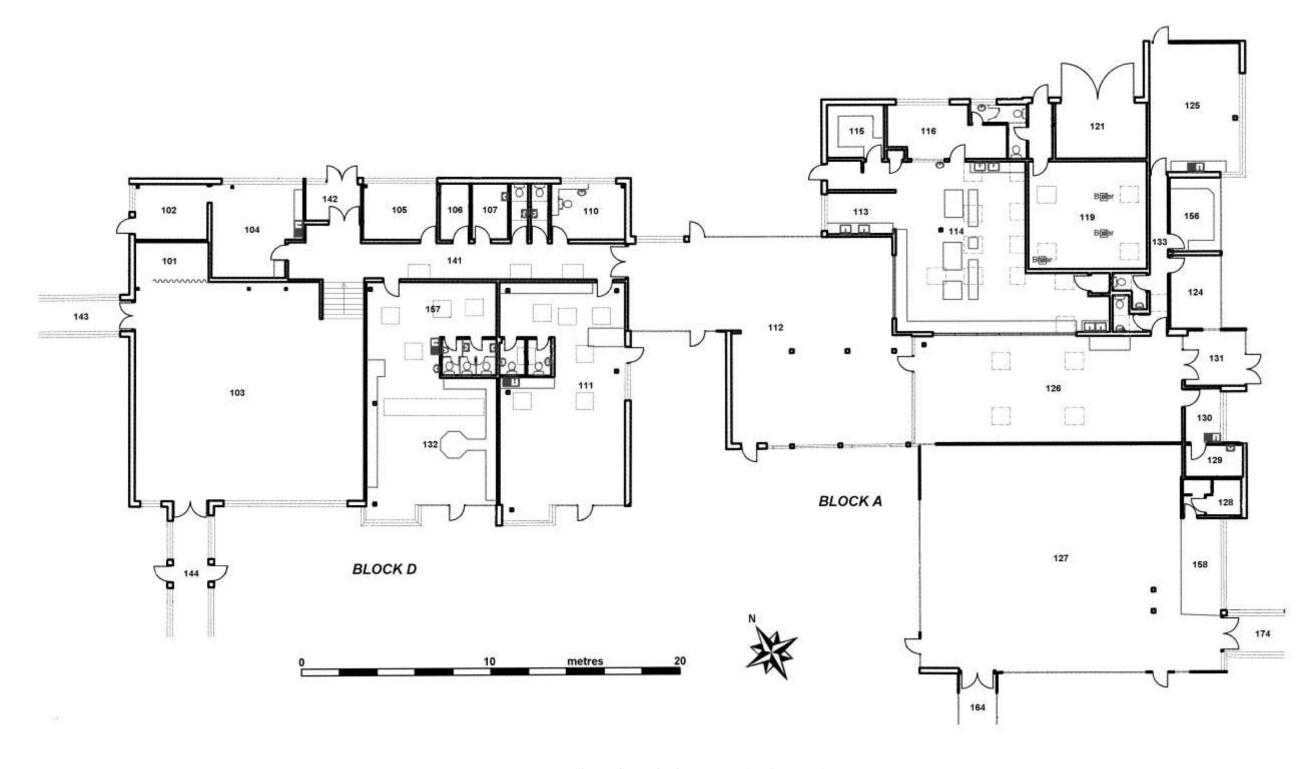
Floor plan, Blocks A & D (scale 1:200)
